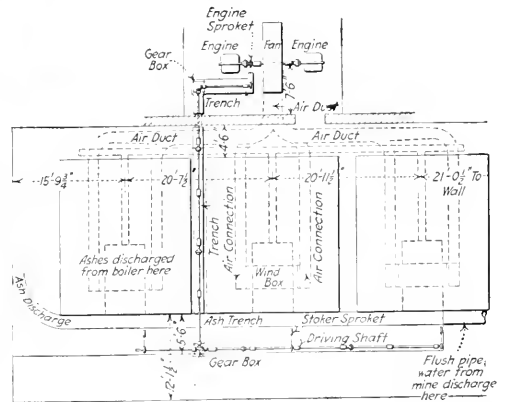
PLAN OF BOILERS, ASH TRENCH AND AIR DUCTS
